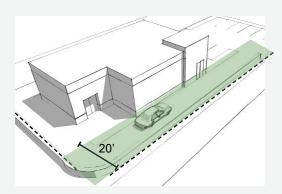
Contemporary Overlay Parking and Drive Aisle Location. Within the Contemporary Overlay, vehicular areas are allowed between the building and the primary street within the 0-20 foot build-to area as long as all screening requirements are met.
